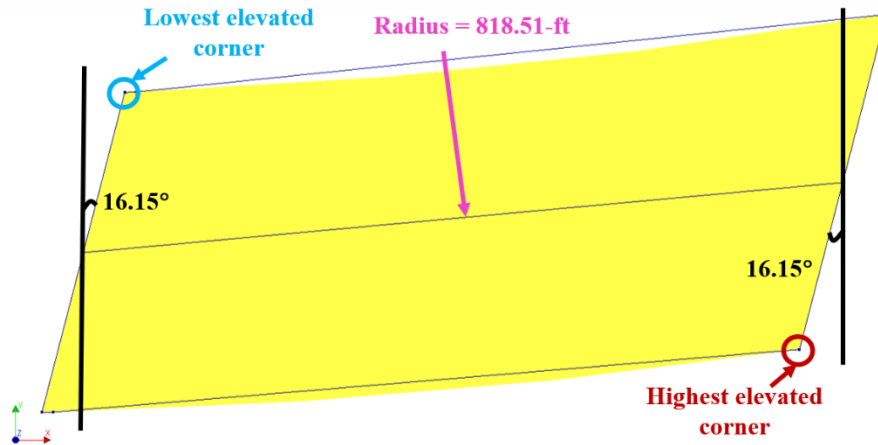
Plan view of curved and skewed deck (Span 1 of the SR299 bridge).
